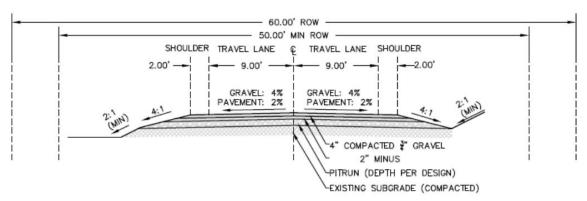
Minor Collector Cross Section for Teton County, Idaho.
